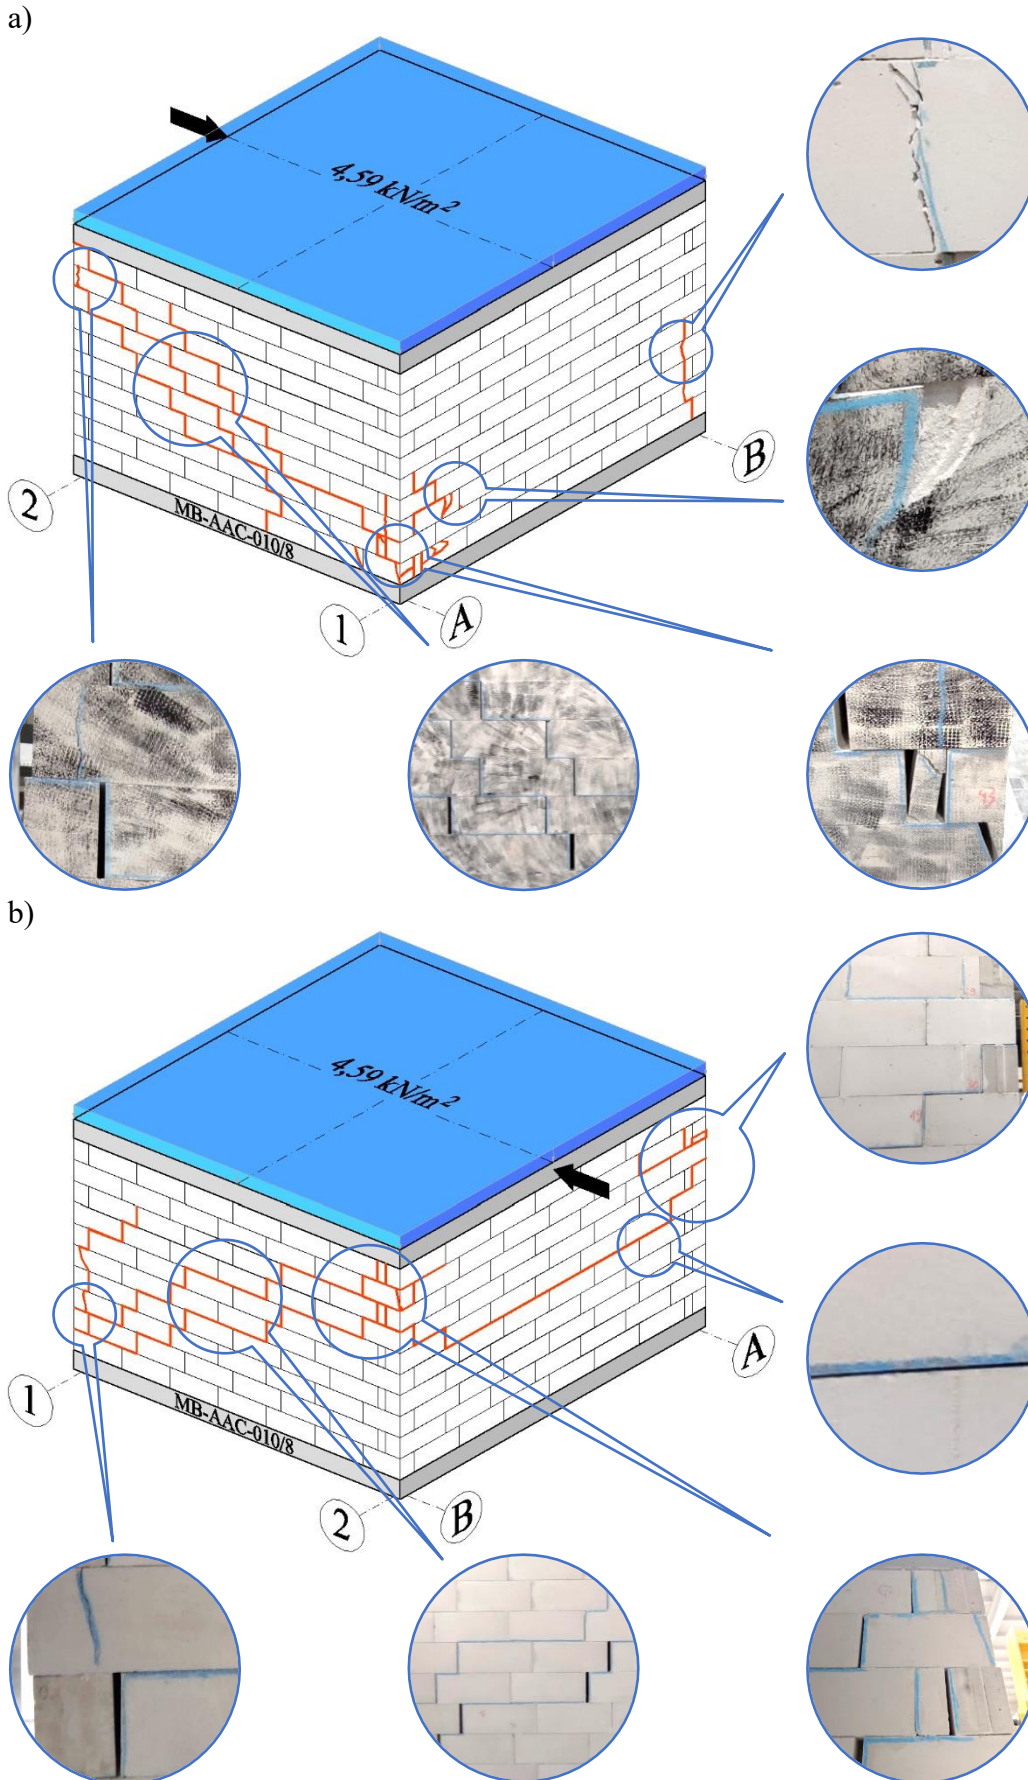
Crack pattern – model MB-AAC-010/8: a) view of the stiffening wall A without an opening, b) view of the stiffening wall B without an opening
